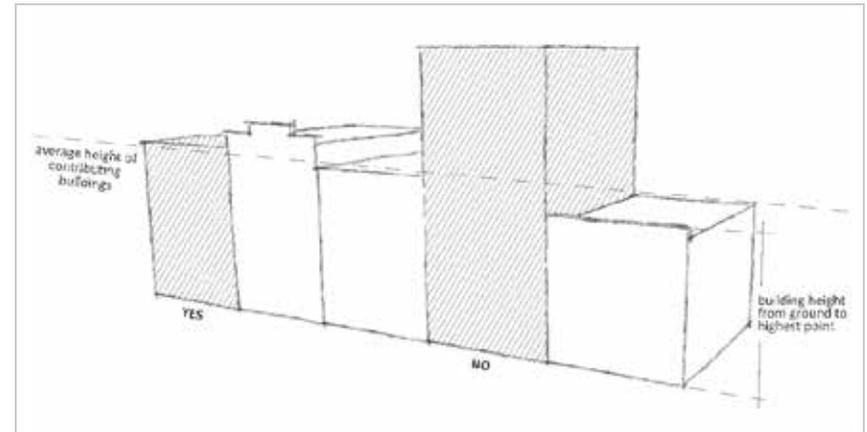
Sketch depicting use of the average building height of contributing buildings on the block to determine the appropriate height for the front of a new commercial building. Note that additional height may be appropriate if it is set back from the front wall per standard 3.4.2.2(f–g). Source: HHM archives.
